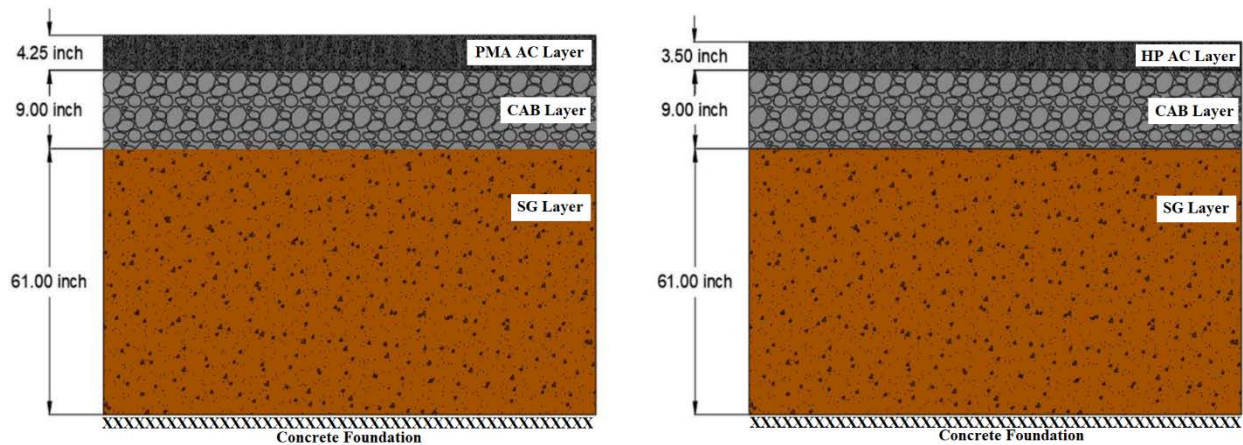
PMA and HP pavement sections in the PaveBox experiments.
